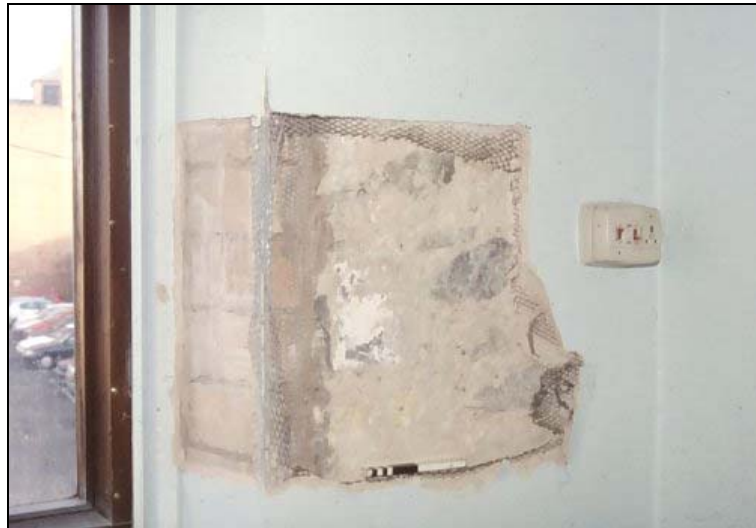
Area 12 opening to investigate internal wall coverings/window W16
